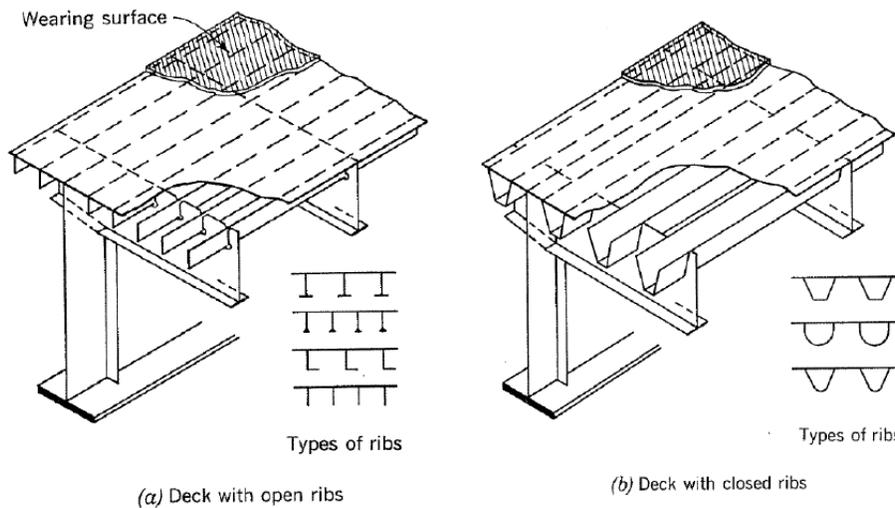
5 Orthotropic Steel Deck Bridge [15].
